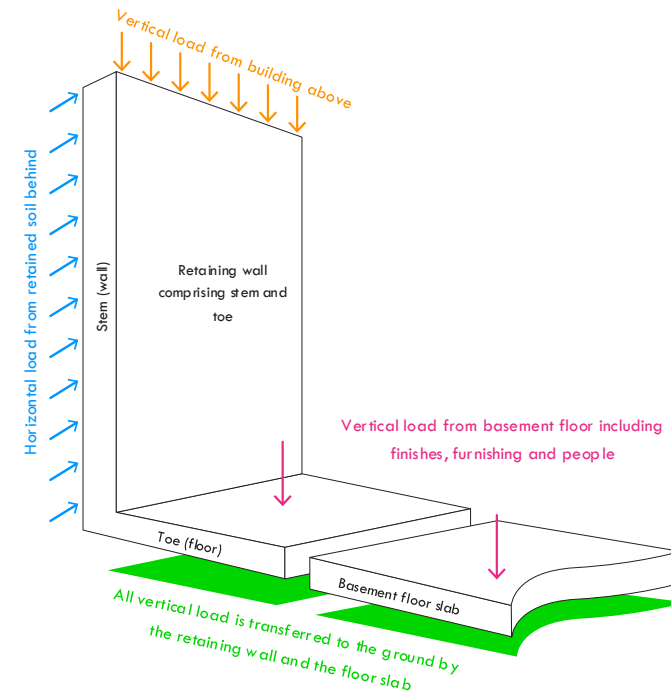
Schematic diagram showing structural elements associated with typical domestic basements, namely the basement floor slab and the retaining wall. Typical loading subjected on structural elements also shown.
